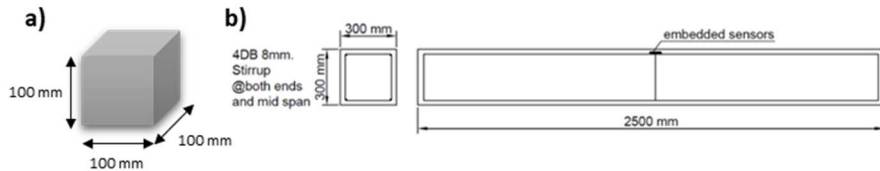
Concrete specimen a) 100 mm cube and b) semi-large-scale beam.
